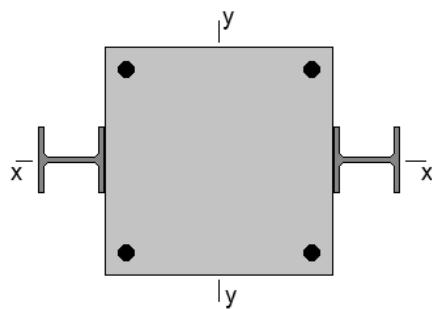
Strengthening with load-bearing steel profiles on the sides of the column.
